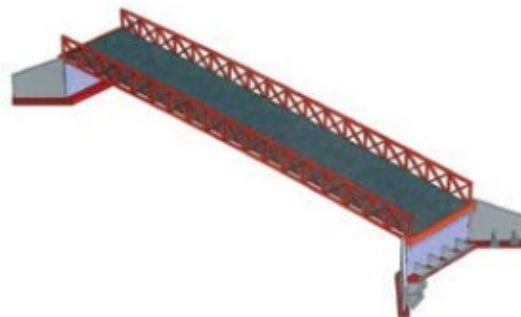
Eastern Bridge Design (courtesy Contech Bridge Solutions)
